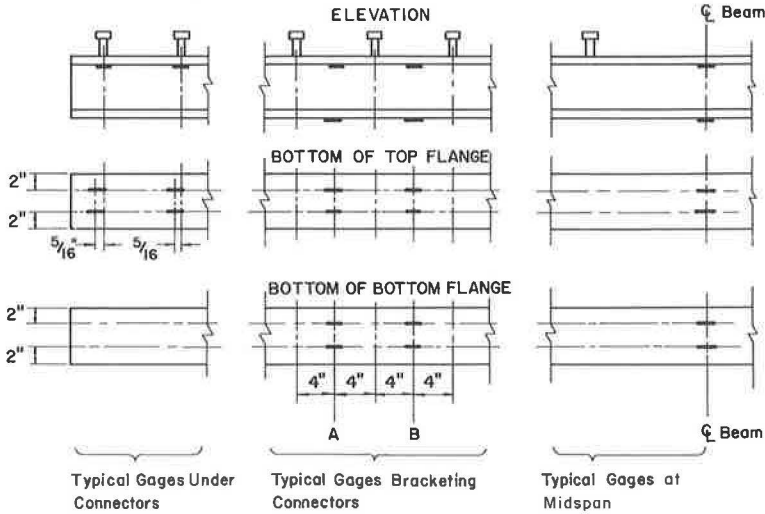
Typical strain gage locations for BF-1 through BF-8.
